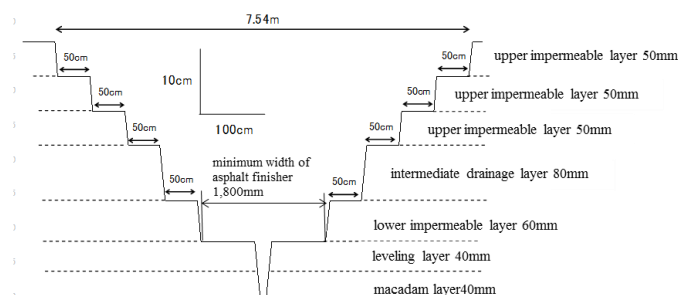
Cross section of repairing work in case of removing all layers around the crack
